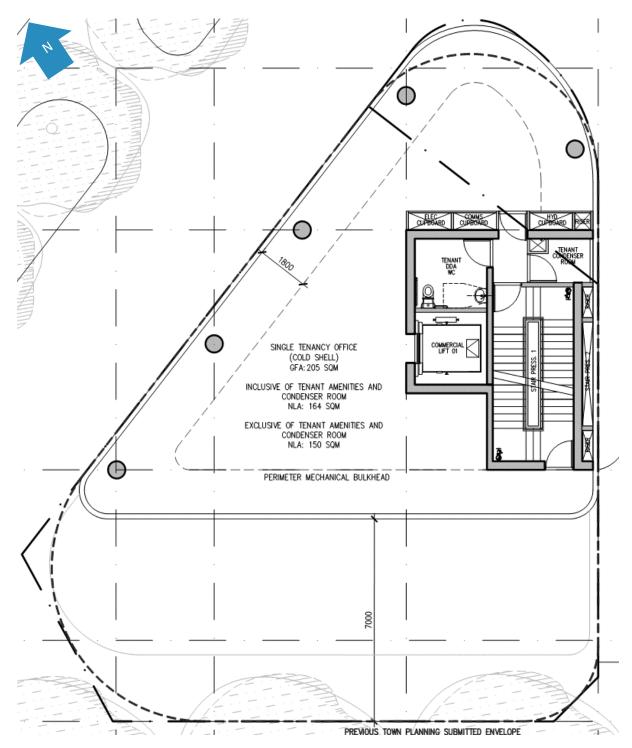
Proposed Floor Plans – Level 13 to Level 17 (Image Source: Elenberg Fraser)
